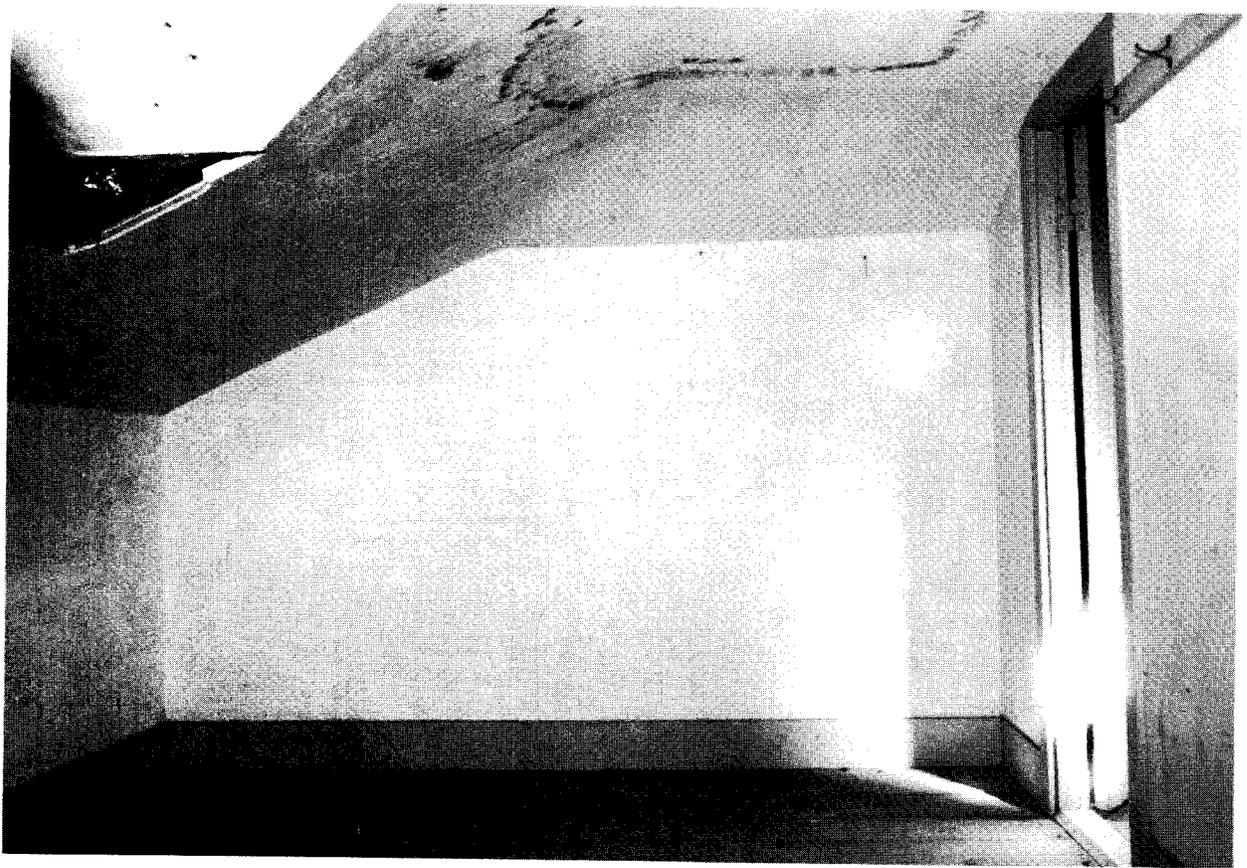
Penniman House: Finished Attic Space (Room 302),
